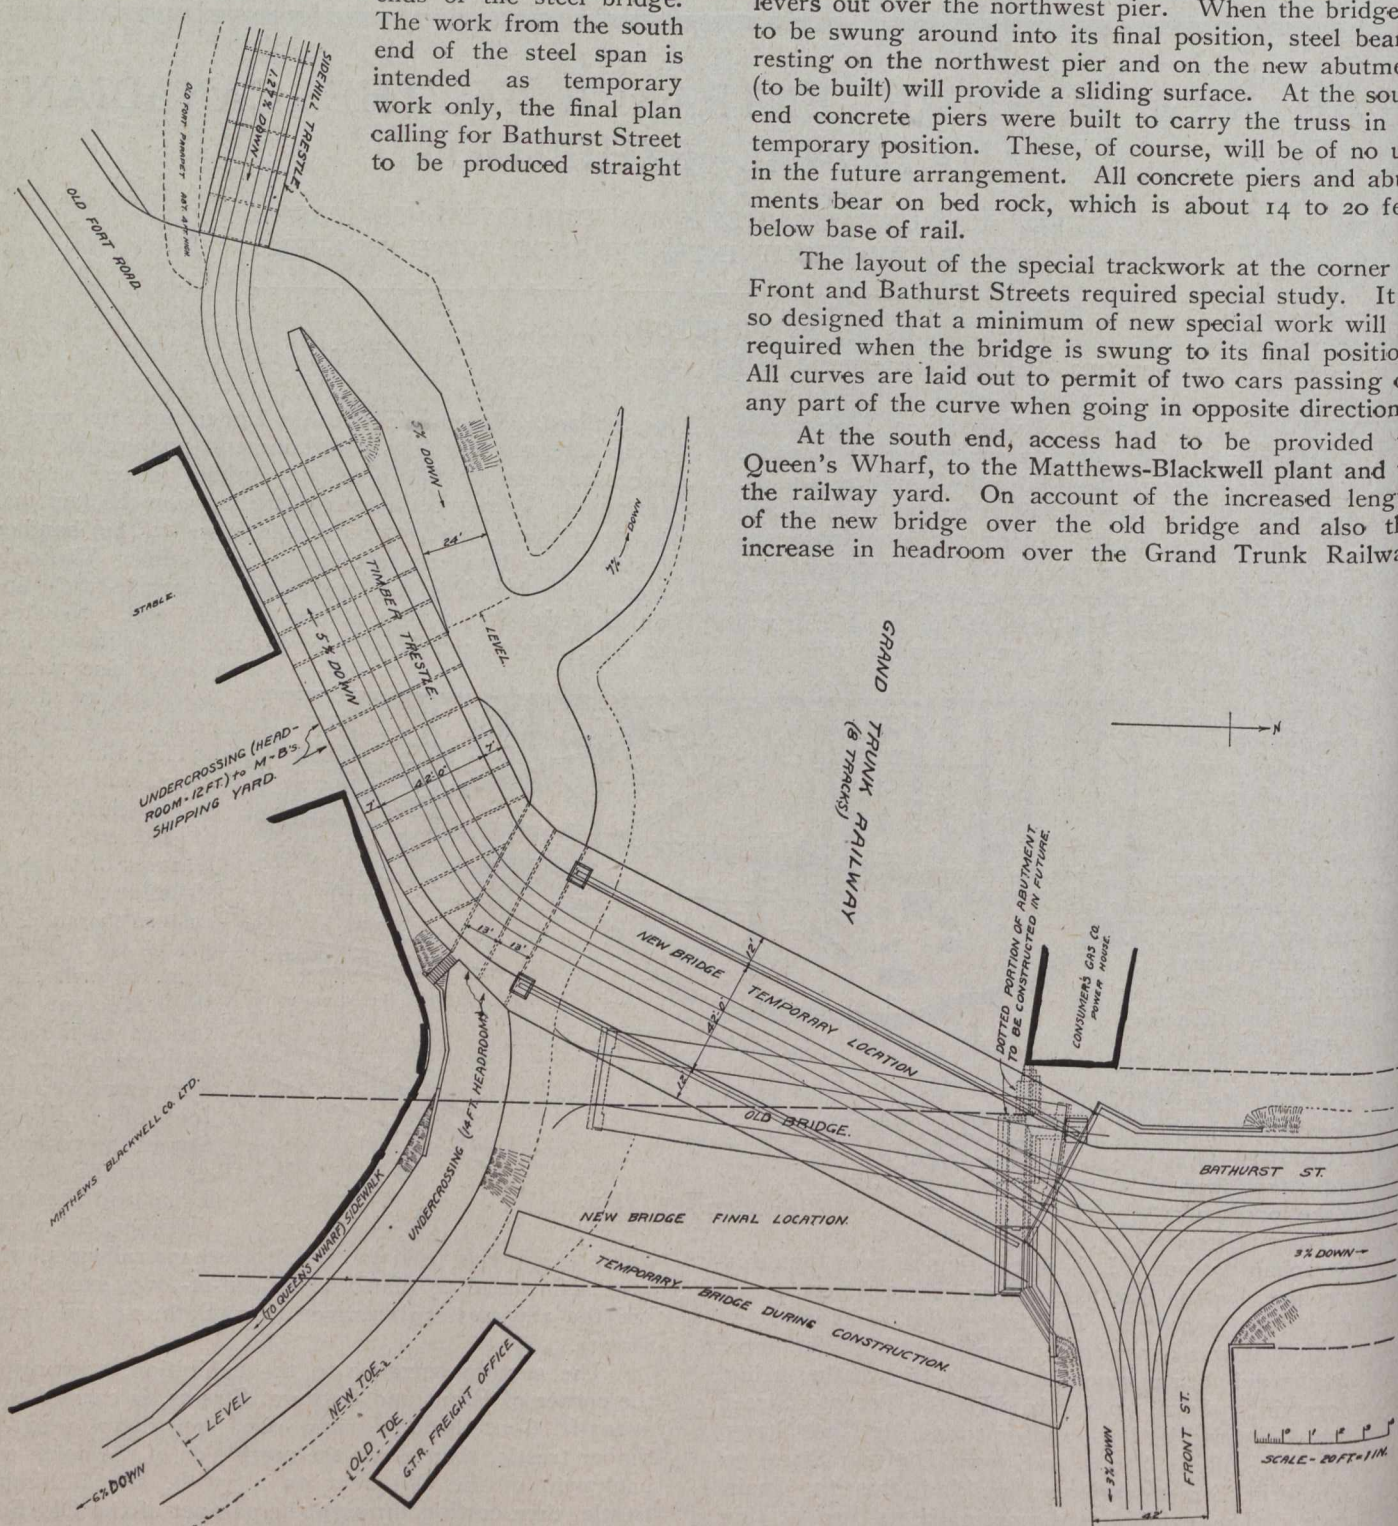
Plan of New Bathurst Street Bridge, Showing South Approaches.
